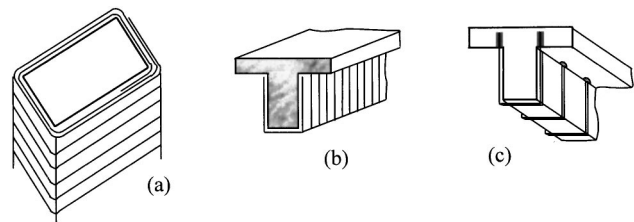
Shear strengthening: (a) closed jacket applied to column; (b) open jacket applied to beam; (c) strips with end anchorage
